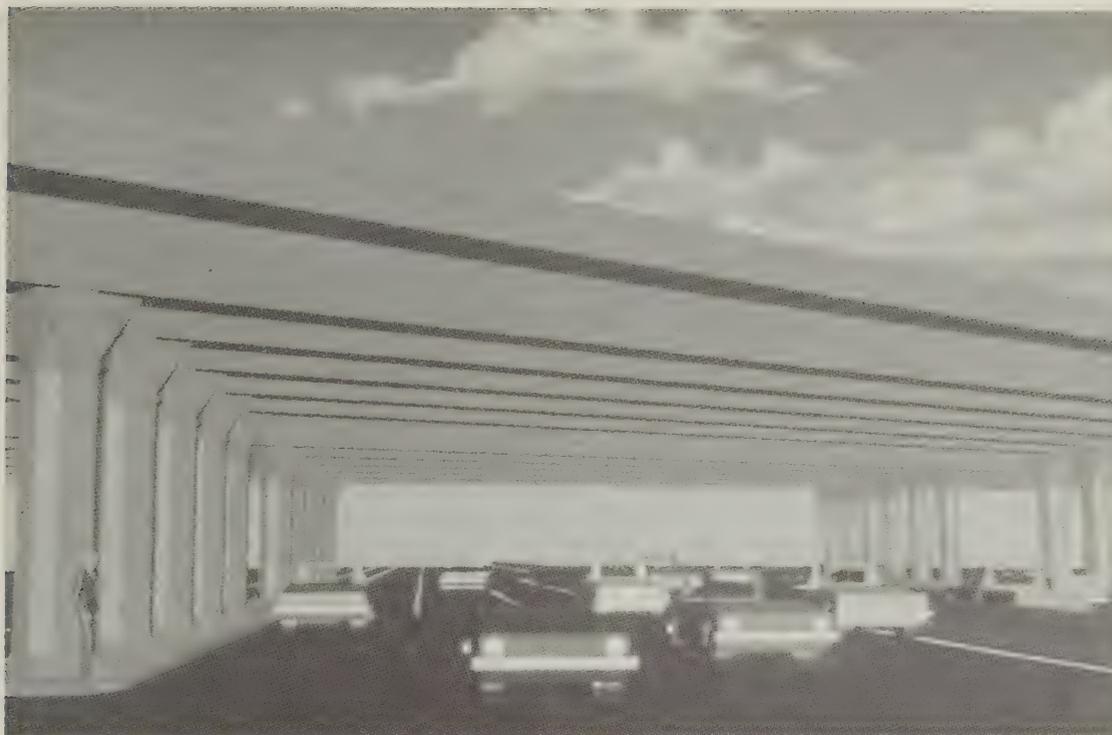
Artist's rendering of the Louetta Road Overpass structures.
